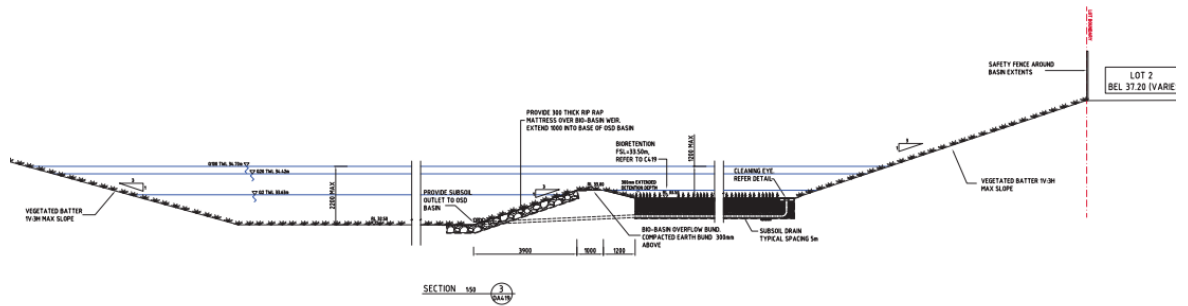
(above) – Civil Section through Basin 1 - Excerpt from approved Costin Roe Civil works plan Sheet 9, revision K.
